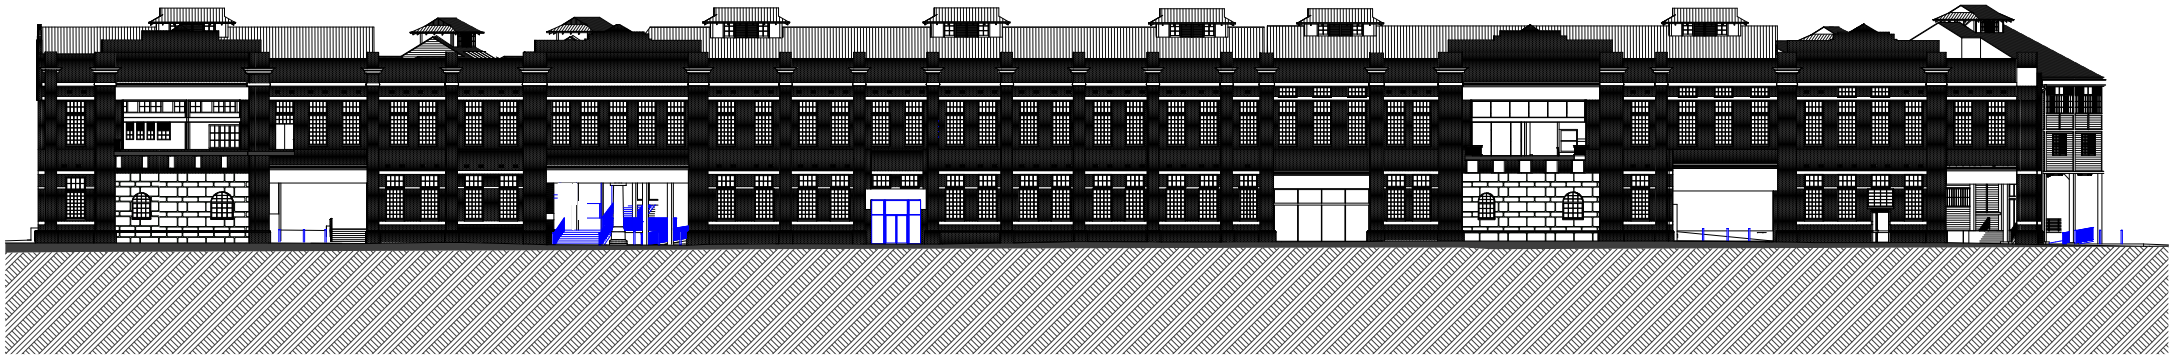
Proposed Hickson Road south elevation Shore Sheds, (alterations shown in blue).
